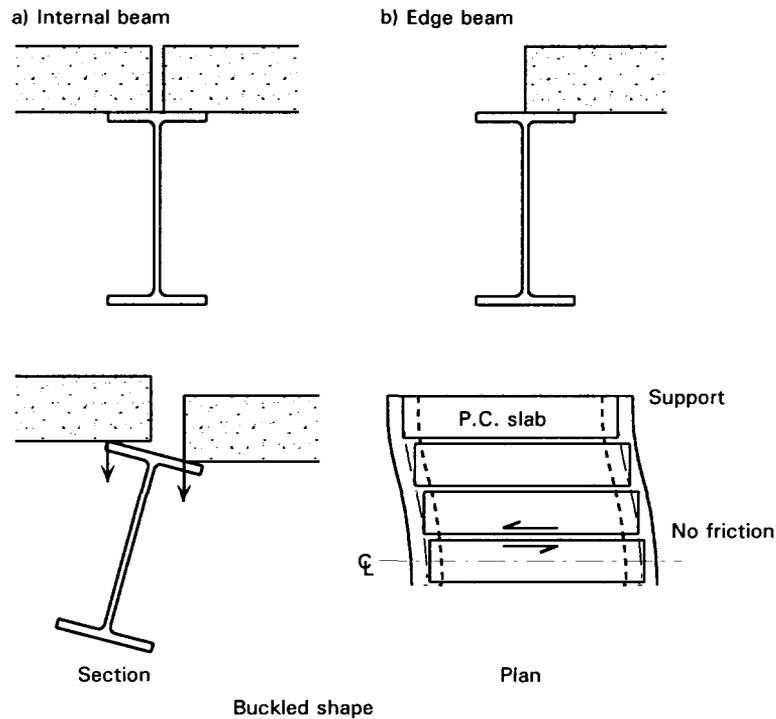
Beam restraint provided by precast concrete slabs
